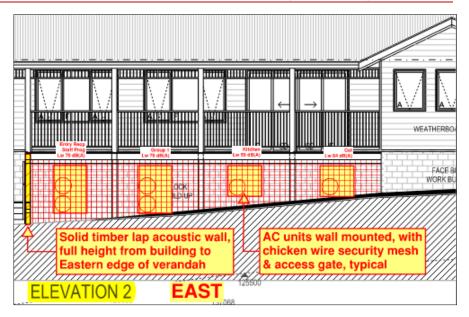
AIR CONDITIONING - GENERAL ARRANGEMENT EAST
